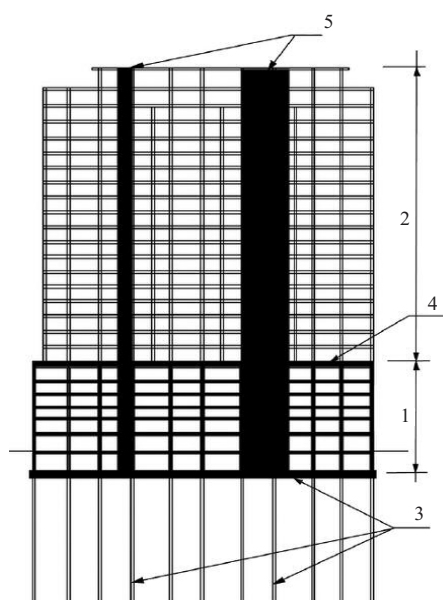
Ascent Tower building in Milwaukee – hybrid structural system; 1 – reinforced concrete podium; 2 – timber frame structure; 3 – slab and foundation piles; 4 – compressed transfer plate; 5 – reinforced concrete communication cores
